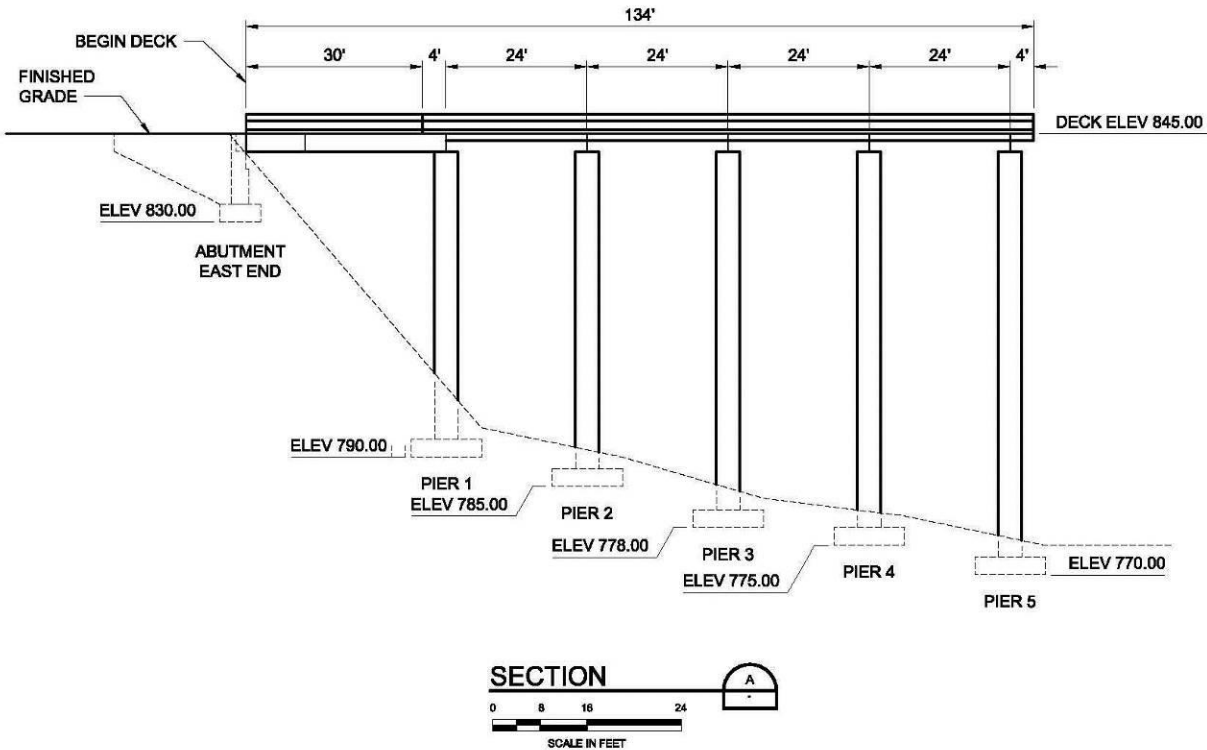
Section drawing of proposed Ward's Ferry whitewater boating take-out facility.
